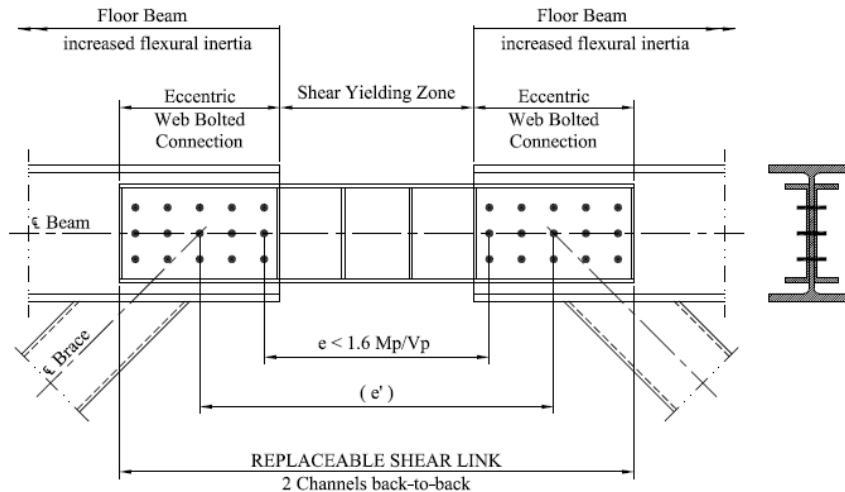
Shear replaceable link with eccentrically loaded web-bolted connection [71]
